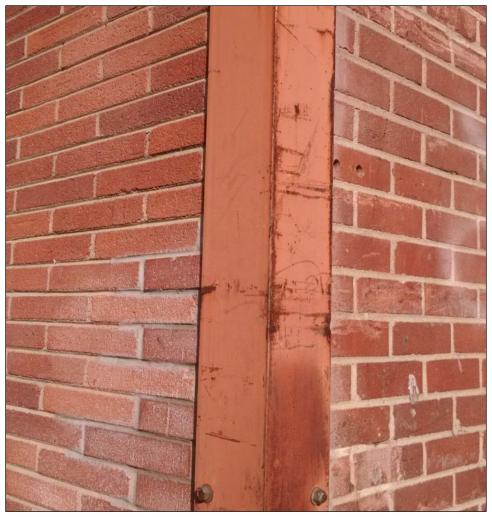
Steel angle bar protecting brick masonry at corner of Marsh Street alleyway behind Rileys building (SWCA, May 5, 2019). Note difference in brick type and dimensions, and in depth of mortar tooling, camera facing west.
